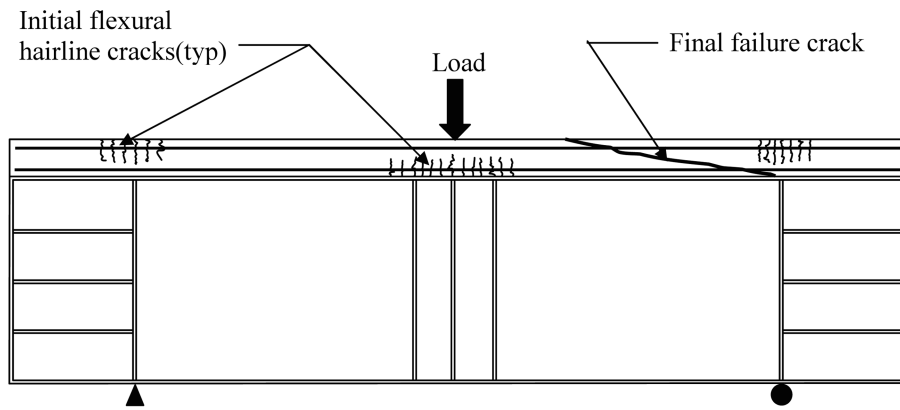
Typical crack pattern observed in girder CPG1
